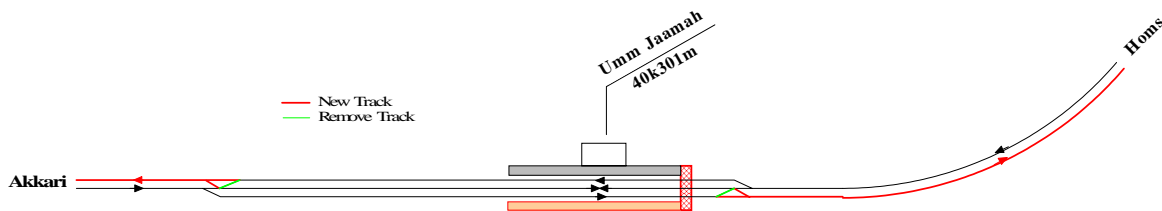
Sketch of Umm Jaamah station track layout
